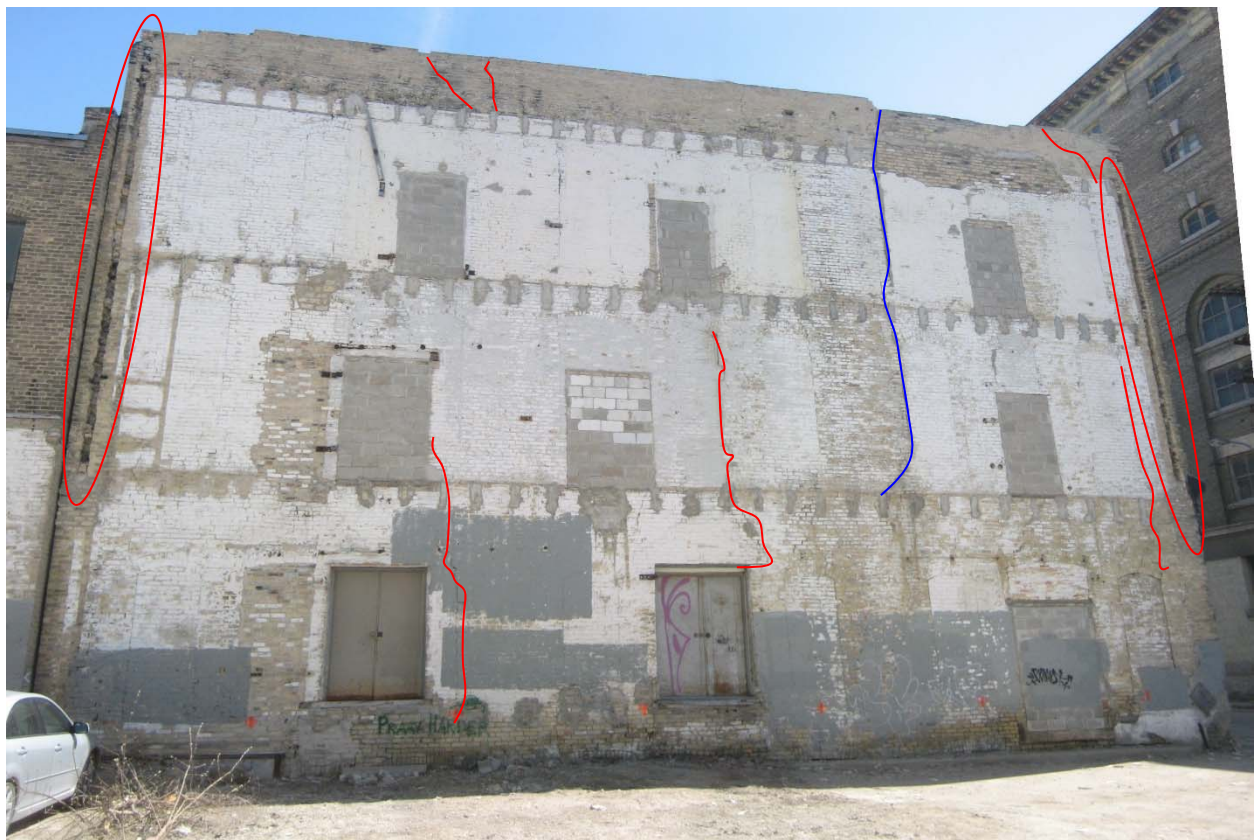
West Façade with Cracks Indicated (2013)
